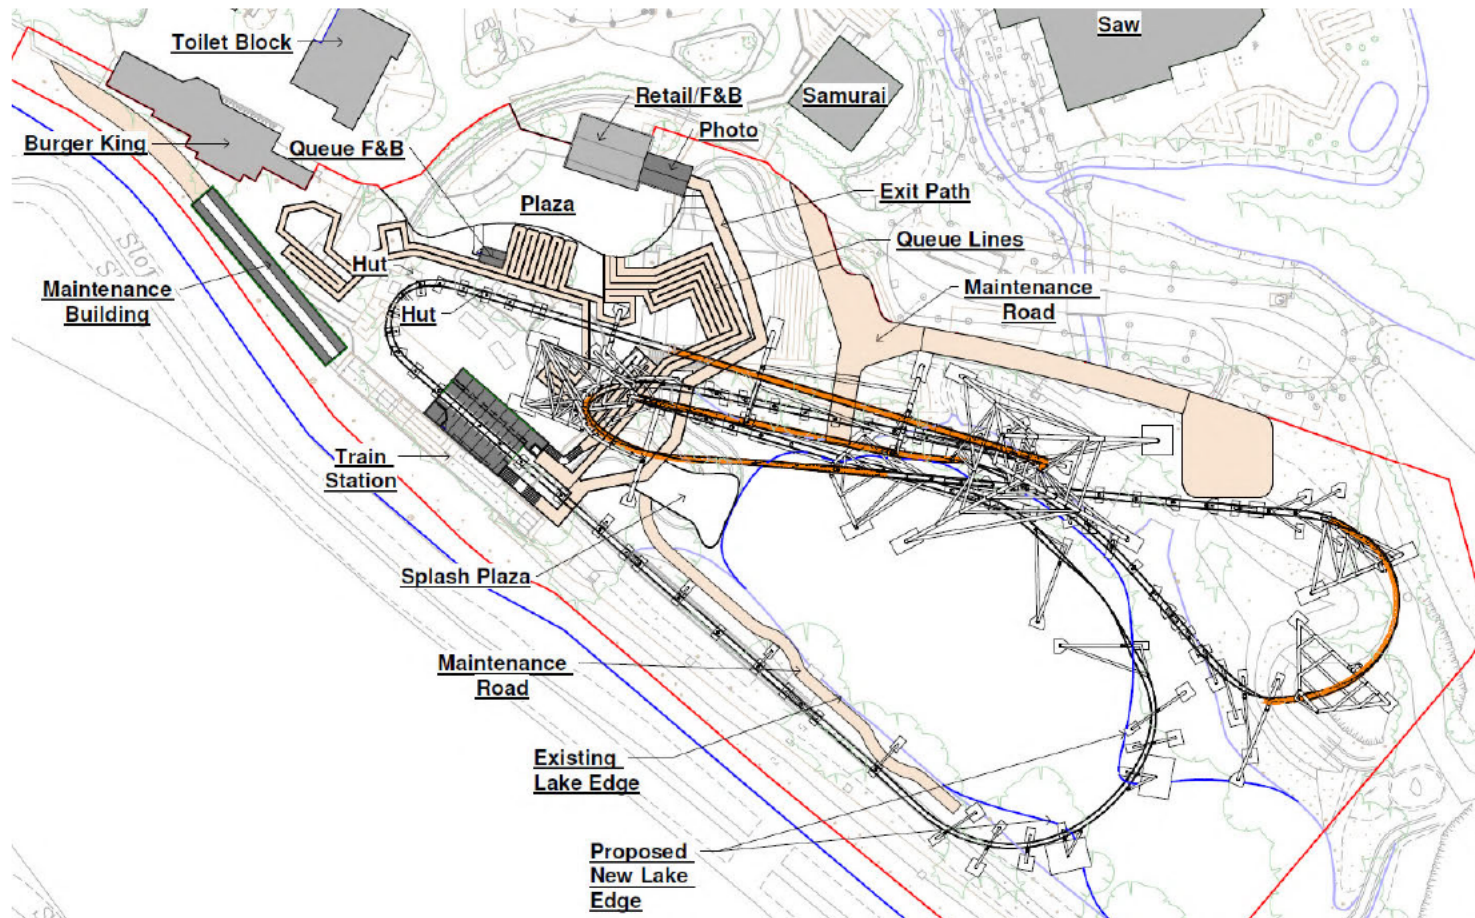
Site Plan with Orange Highlights where track exceeds 25m from GL
